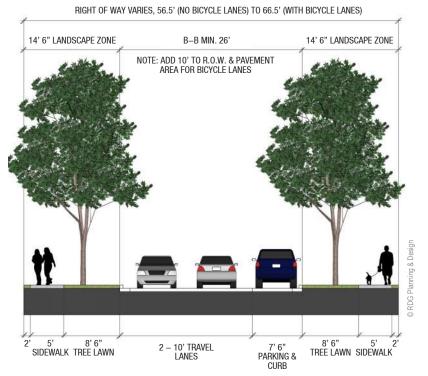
SECTION - TYPICAL LOCAL STREET, TYPE C
